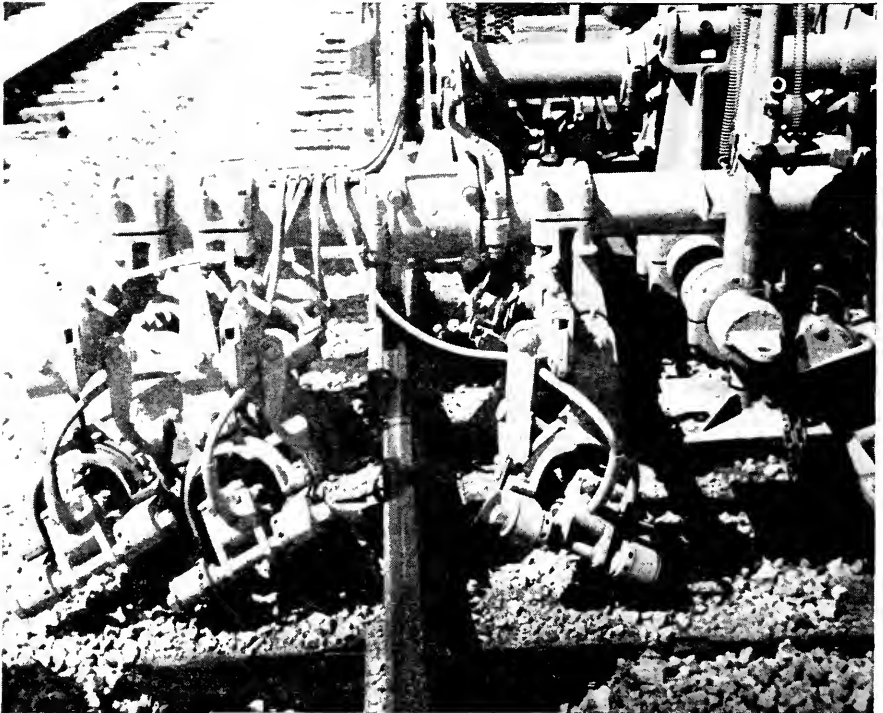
Close-Up Showing Mounting of the Vibratory Tampers.
